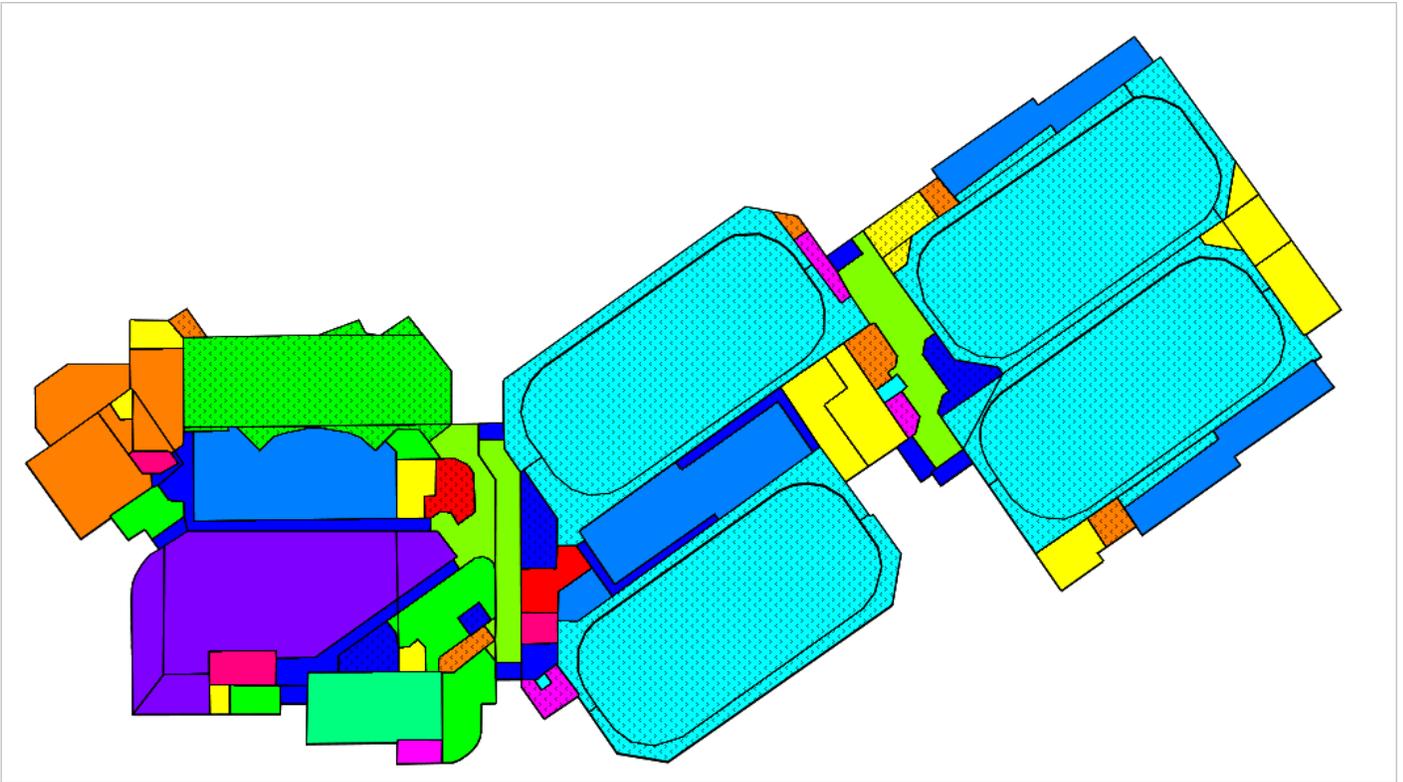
South Fletchers Sportsplex ground floor plan
